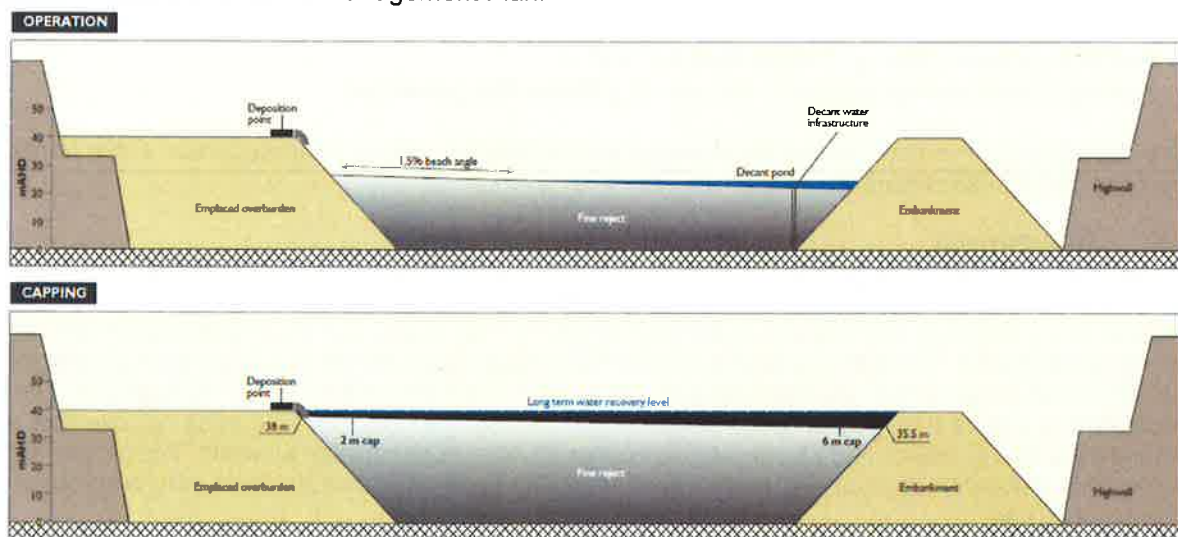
Cross-section showing deposition and capping stages of the fine reject emplacement in the Carrington Pit
